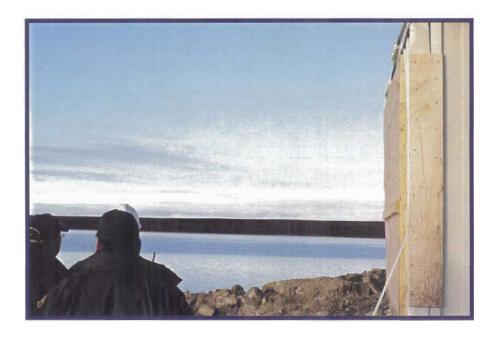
Frustration Lake freshwater intake pump house. Wall damaged by wind driven ice from lake.
